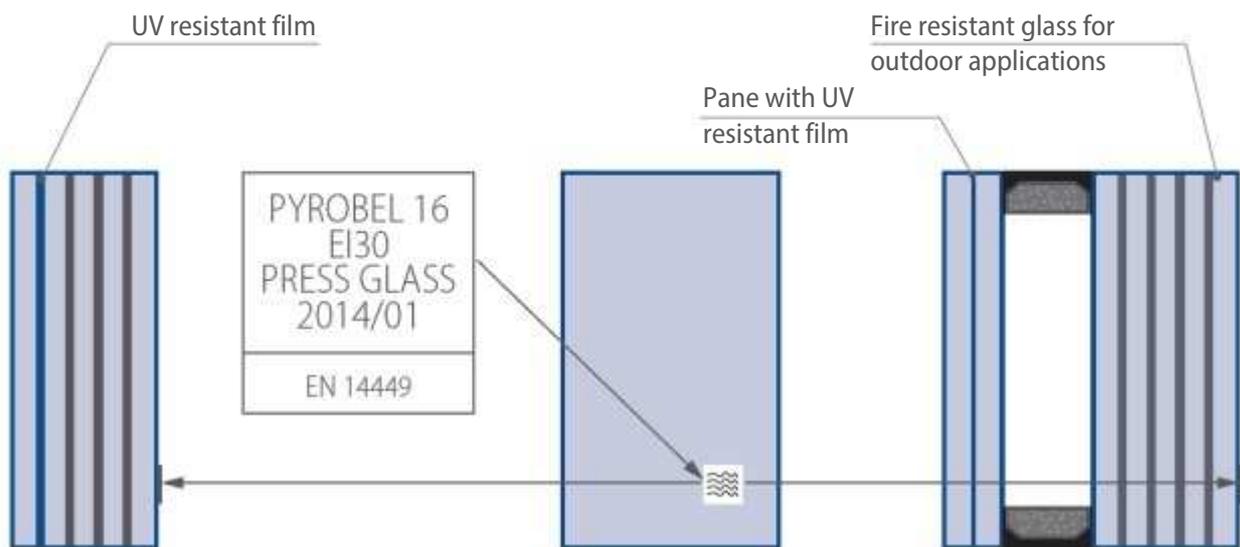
Location of marking on glass for indoor and outdoor use and on glass units
